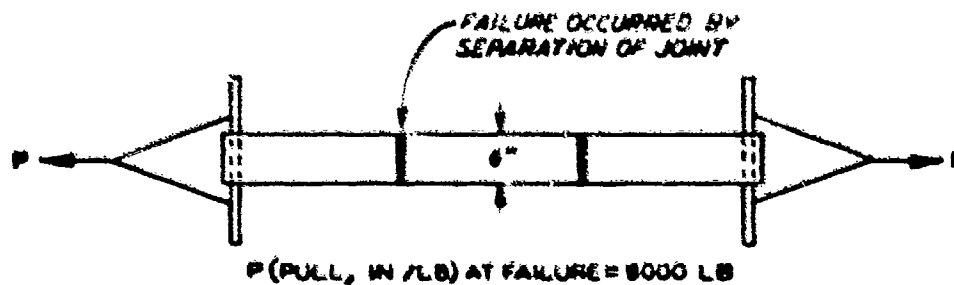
AM2 Test No. 4 tension test with 6-ft sections of mat
